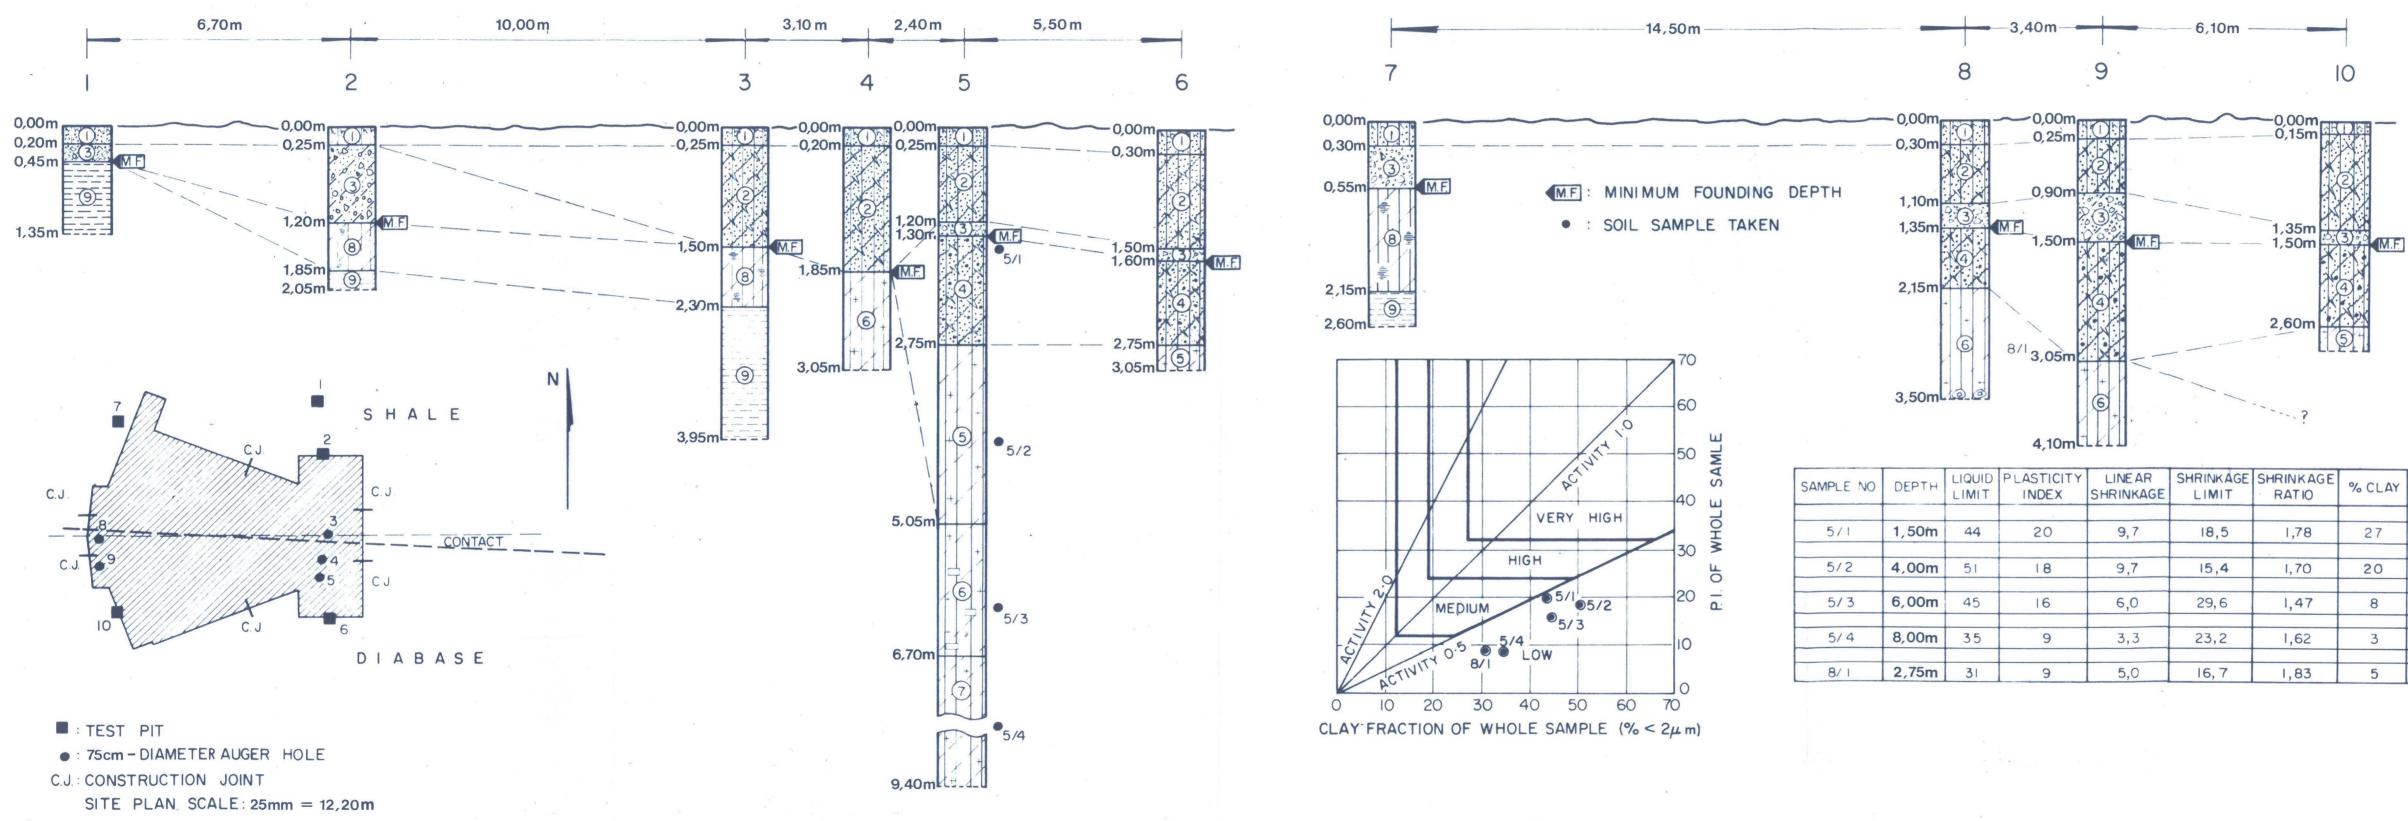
/4 : Site plan of church building in Waverley, Pretoria, showing soil profiles developed on diabase sill and on Magaliesberg shales and indicator test data for residual soils
